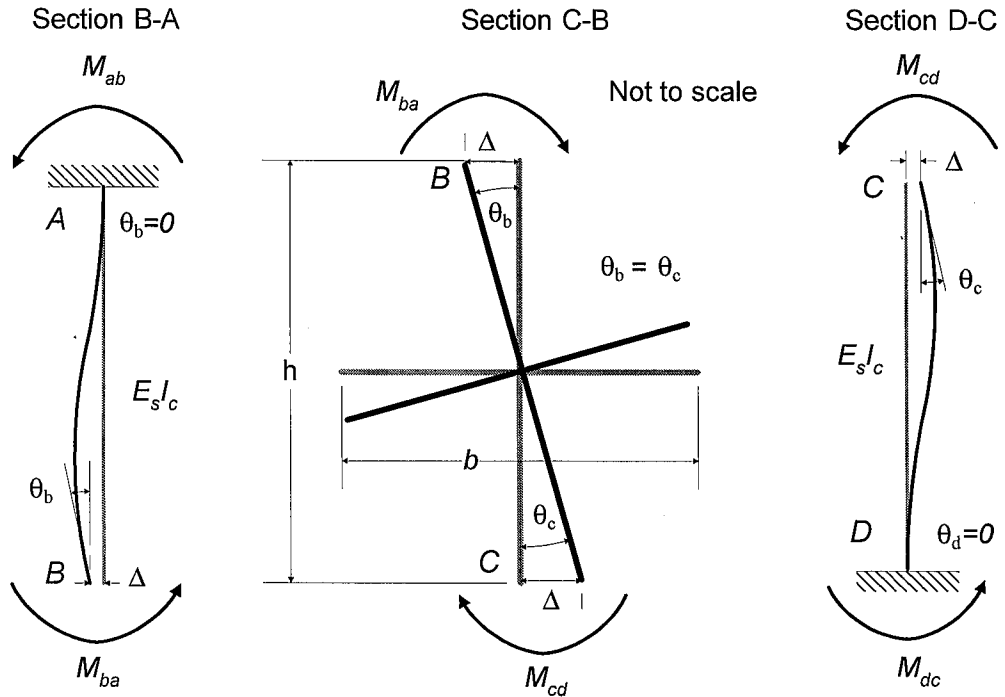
Elevation VI: Column and Panel Zone Sections B-A, C-B, and D-C
